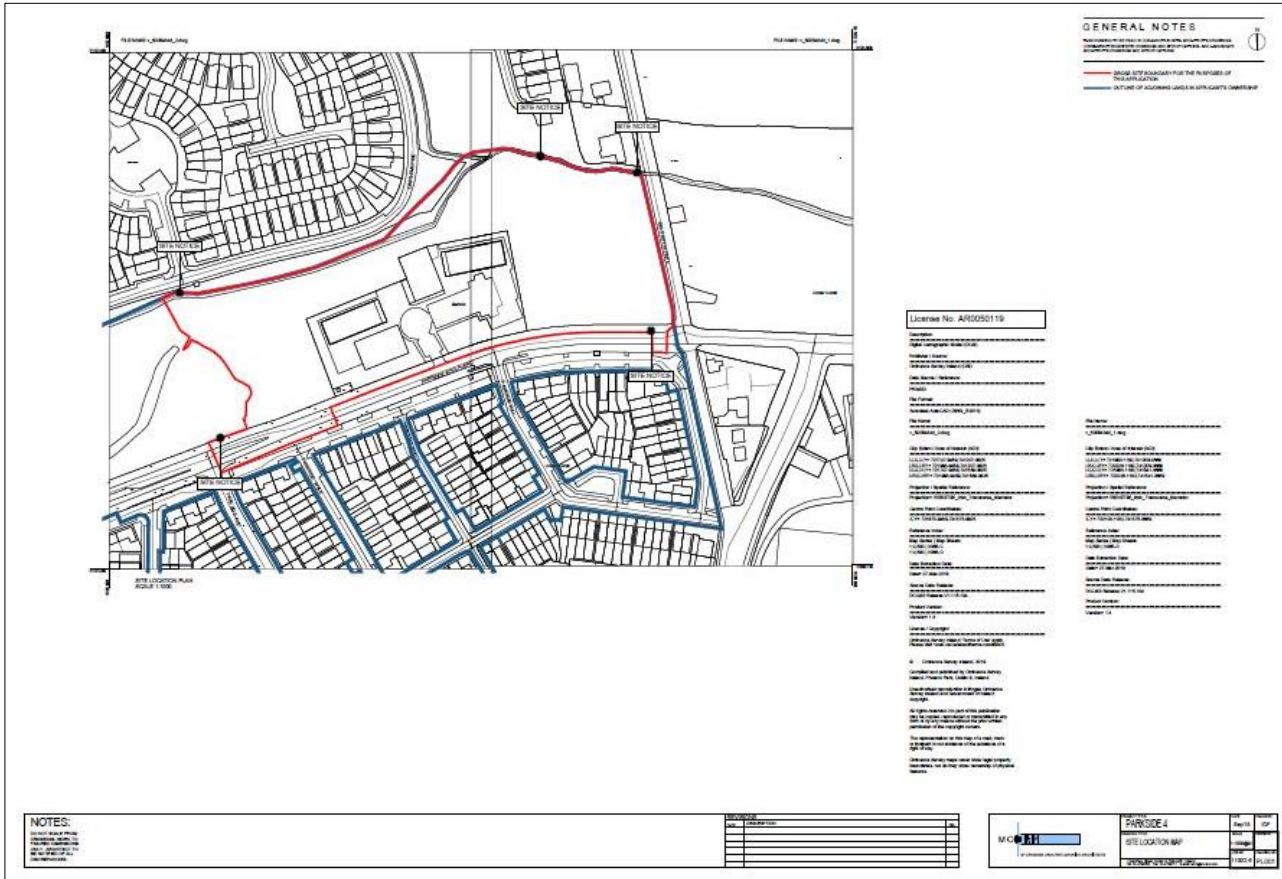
Site layout prior to removal of buildings at Parkside 4, Parkside, Dublin 13.
